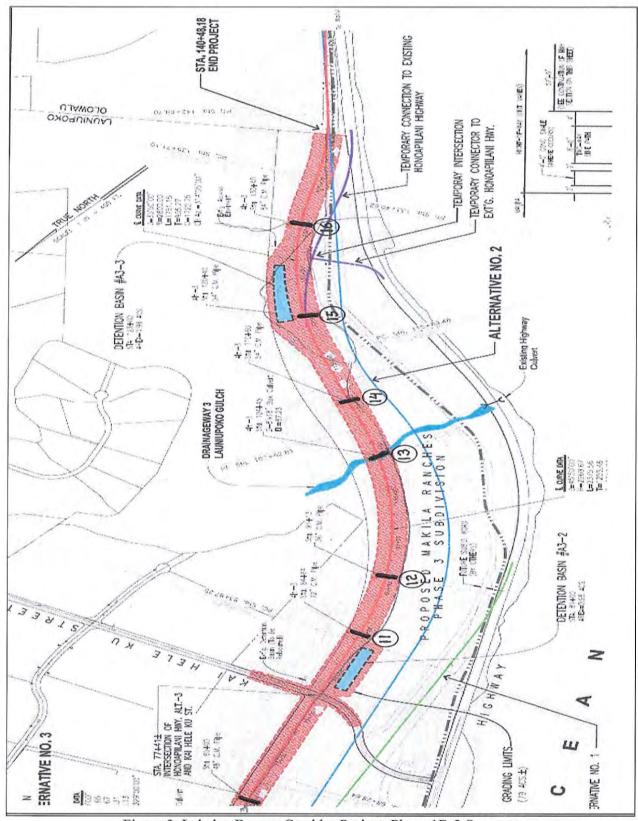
Lahaina Bypass Corridor Project, Phase 1B-2 Segment Drainage Engineering Plan – Southern Half
